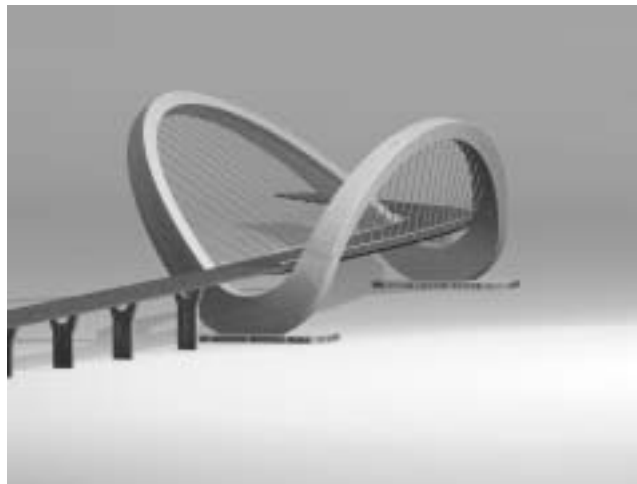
Ling-Tie Bridge – Artist's Rendering
